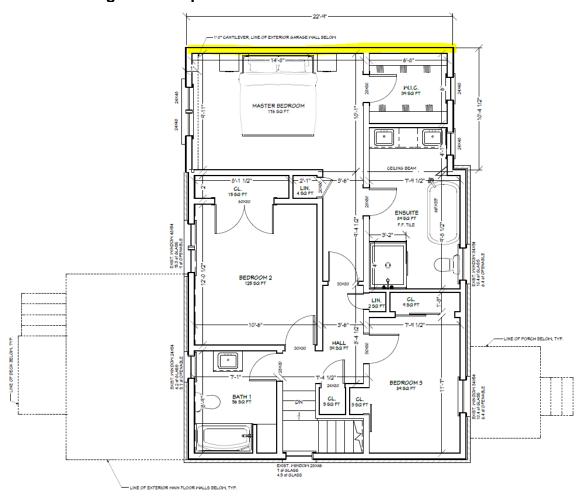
Second storey addition (highlighted building wall closest to side yard)
